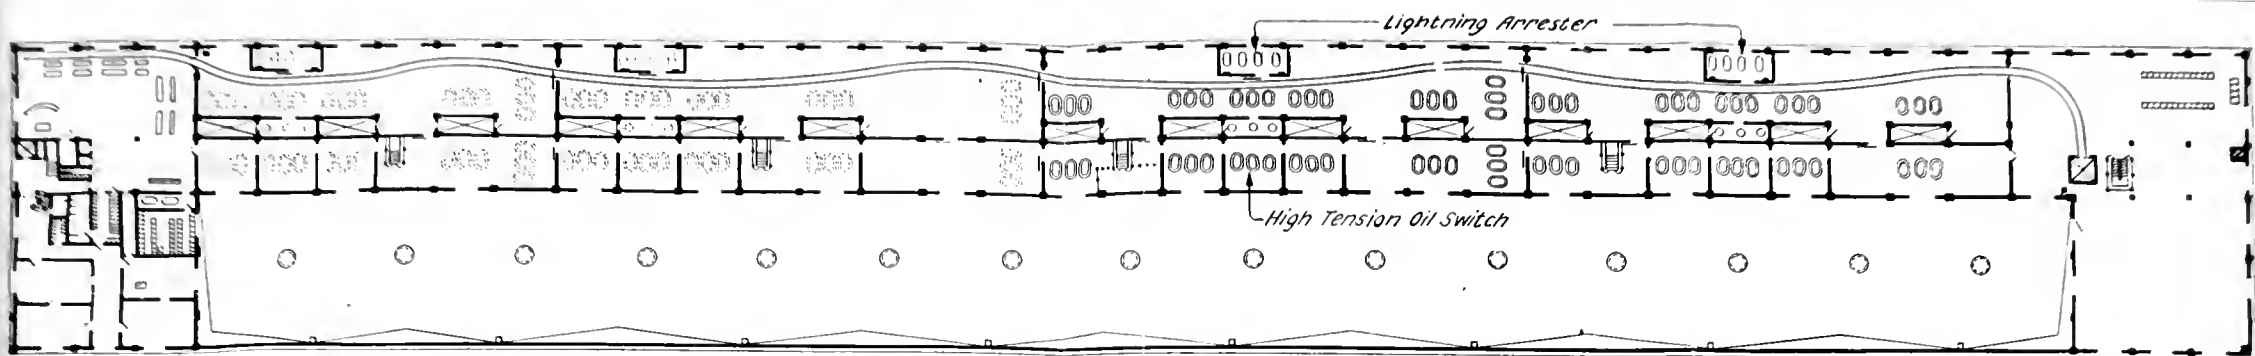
Plan of Fourth Floor of Power House, Showing Location of High Tension Switches and Lightning Arresters. Dotted Units Indicate Future Installations
